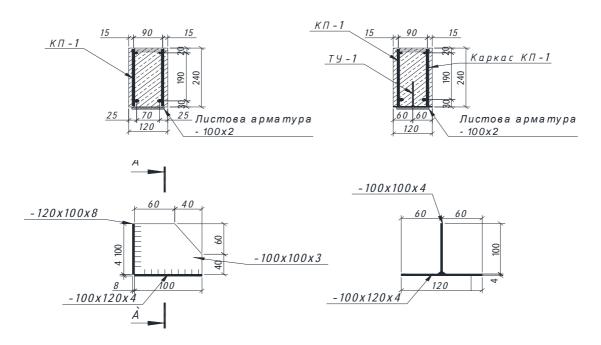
The design of the experimental beams with additional reinforcement (section 1-1, section 2-2)
